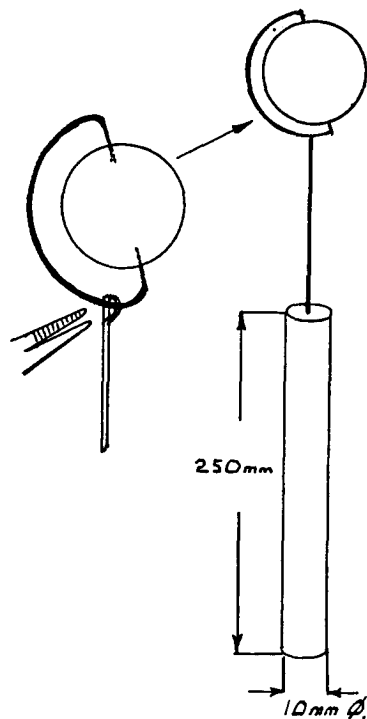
From a piece of 10mm dia wooden doweling cut two pieces each 250mm long. Drill a small hole in the end for inserting metal wire available. Drill two small holes diagonally opposite each other in the two wooden balls to be used as the Earth and the Moon. Bend a suitable length of wire as in Fig. 5. to act as the axis and support for the balls. Make one for each ball. Take a straight length of stiff wire and bend one end over the ball support as in the sketch. Crimp this loop tightly over the support using long nose pliers, (this joint could be soldered if steel or copper wire is used). Leave the length of straight wire uncut until final assembly. Assemble the apparatus by gluing the support for the Sun in the hole in the base. Slide movable arm (i) over the support and ensure that it will rotate. Screw lamp support disc to the top of the column and then fix the lamp holder to this disc. Glue Earth support rod into the 10mm hole in the moveable arm (1). Slide moveable arm (2) over this column and ensure that it will rotate. Glue support rod for Moon in second hole. Finally insert Earth and Moon assemblies into respective supports. (Ensure that the centres of the Sun, Earth and Moon are all in the same horizontal plane).
